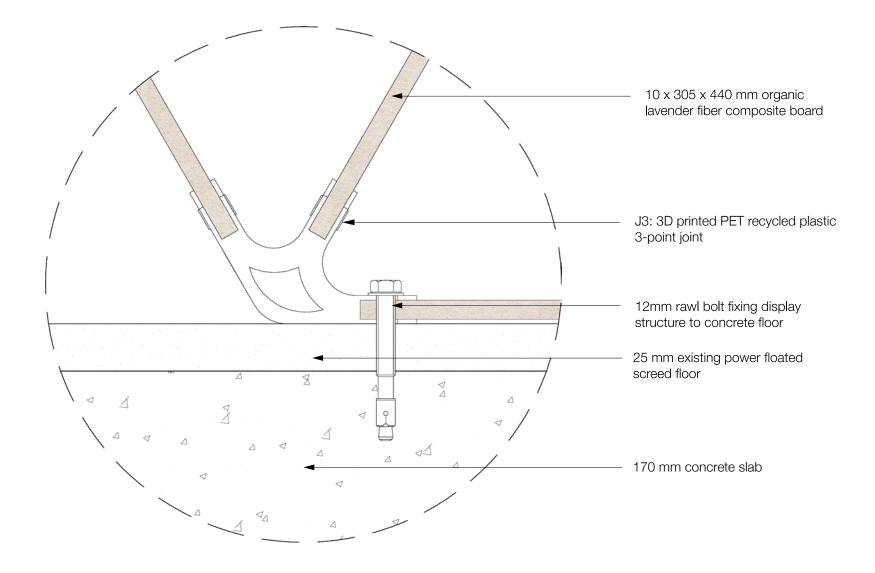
Detail 3: Dry wall connection (Author, 2016).
